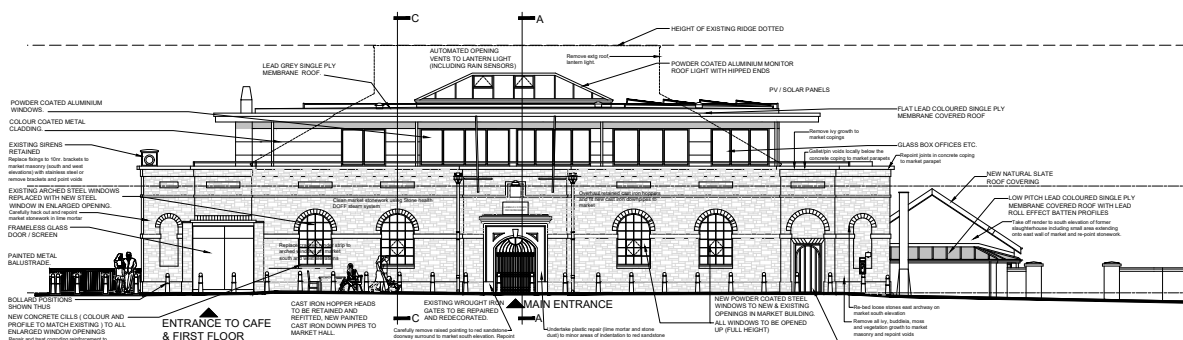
above: Proposed south west elevation - source Pembroke Design Ltd illustrating opening up of blind recesses with new windows, hoppers added to glazed roof, photovoltaics, sunpipe and variation to roof top extension openings including ventilation extracts
